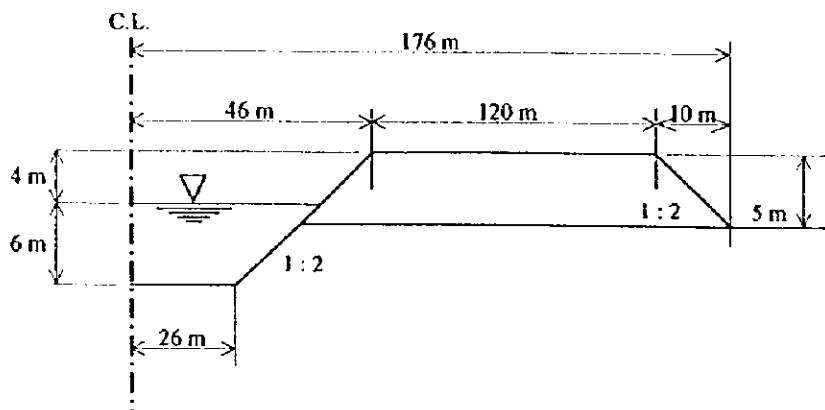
Standard Cross Section of Nadi Diversion Channel
